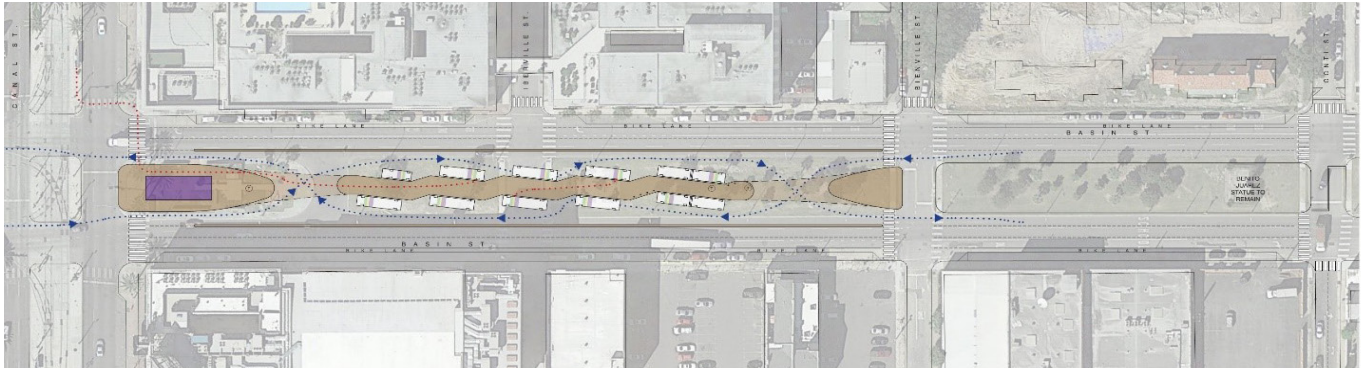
BASIN STREET LAYOUT CONCEPT REFINEMENT (OPTION B) - THREE BLOCK FACILITY, SIDE PLATFORMS
